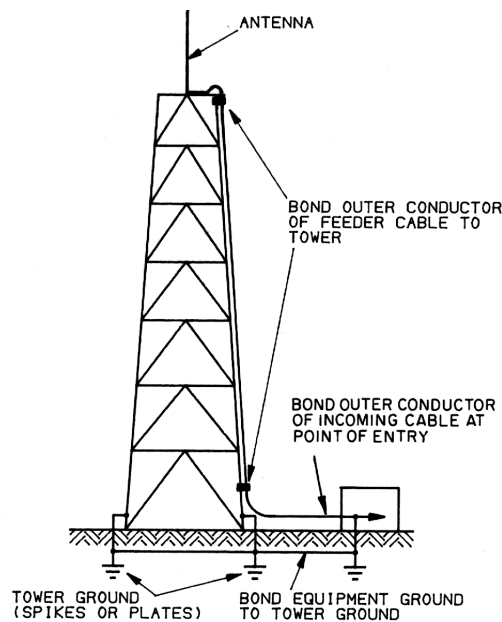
Typical grounding arrangement for a tower with VHF/UHF antennas
